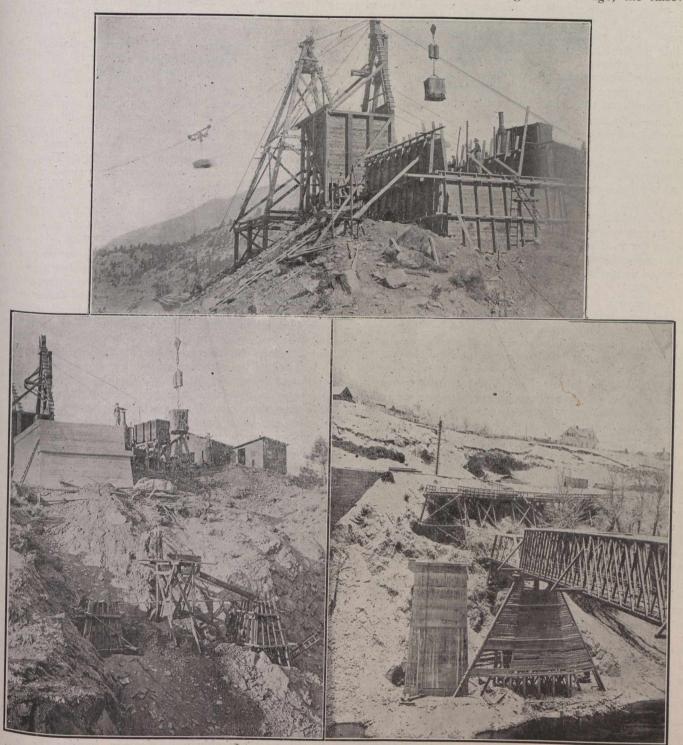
North Abutment in Place, Cableway and Bucket. North Abutment Completed and Pedestals of Steel Bent. South Pier and Timber Trestle Approach.
